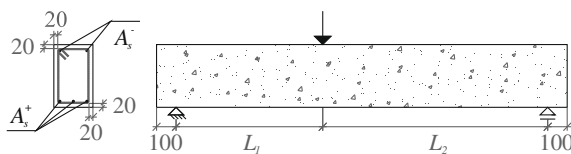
Beam geometry and loading conditions – see Table 1 (dimensions in mm).
